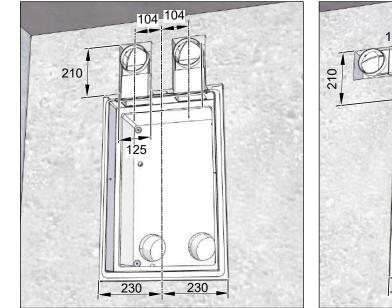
Vertical flat ductwork layout example, dimensions in millimetres
